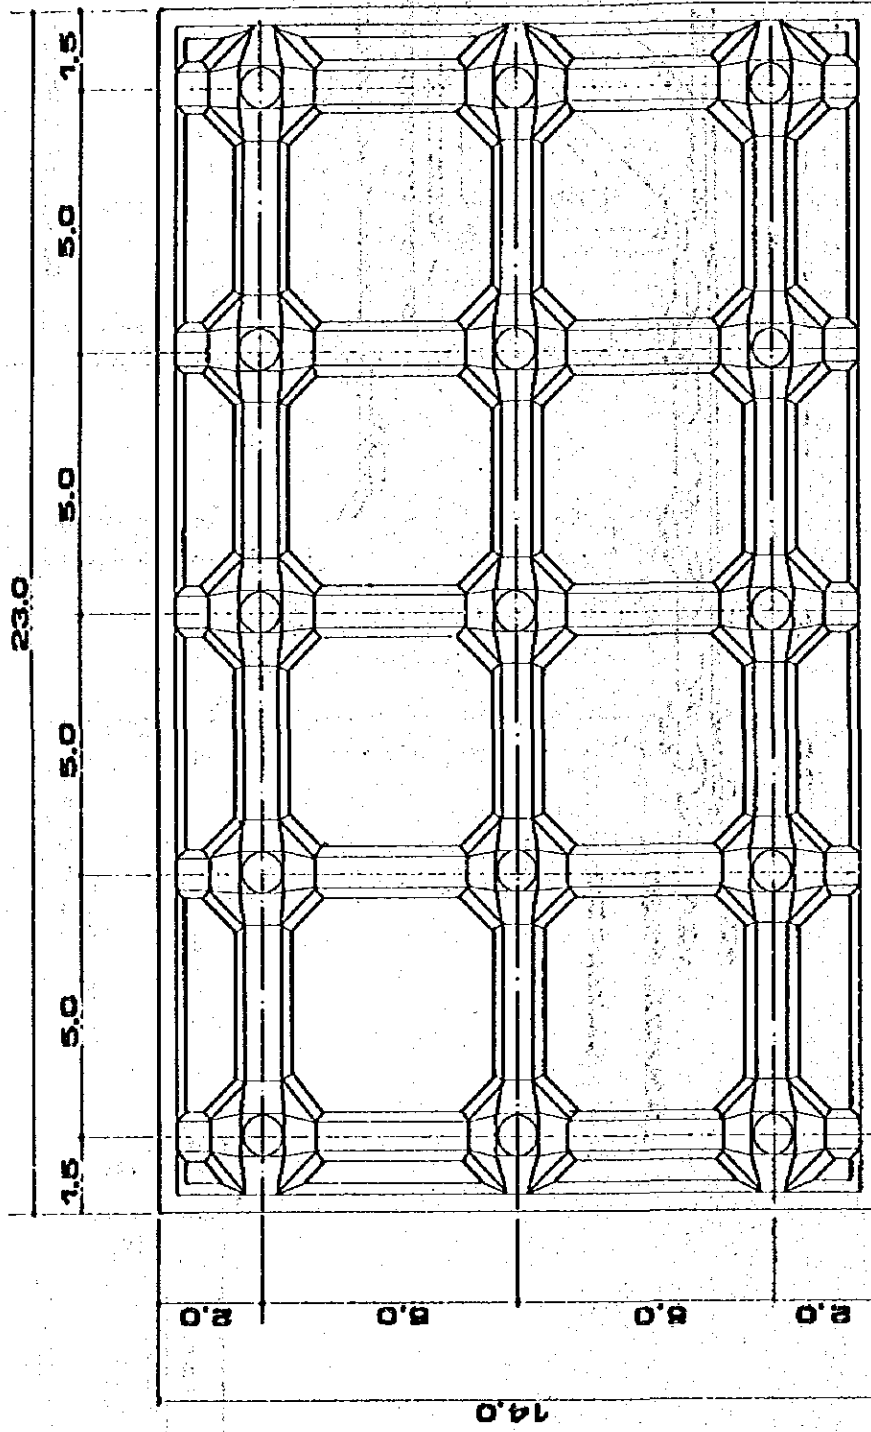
(-10.5) TYPICAL SECTION OF PIER (1)
